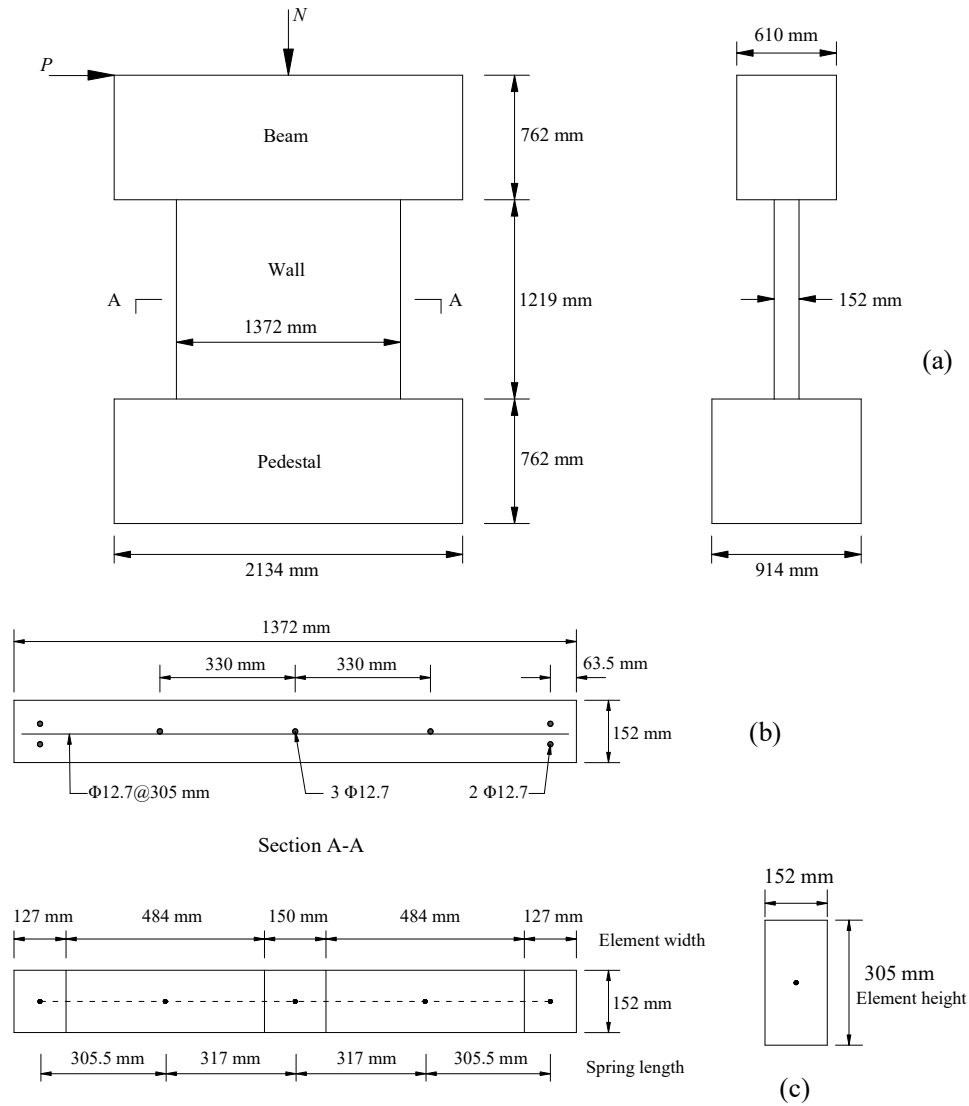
Wall specimen WP1105-8 tested by Massone (2006)
